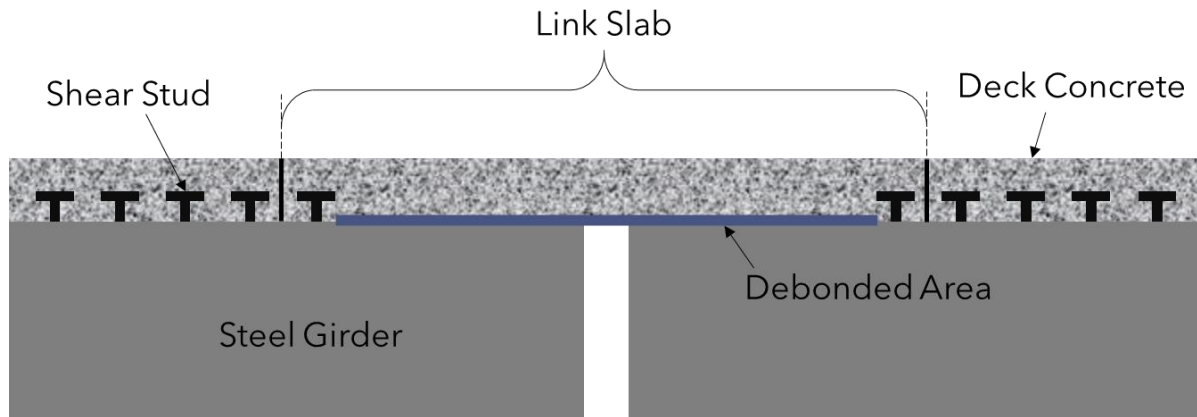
Schematic of a link slab identifying the debonded area between the slab and the underlying steel girders.
